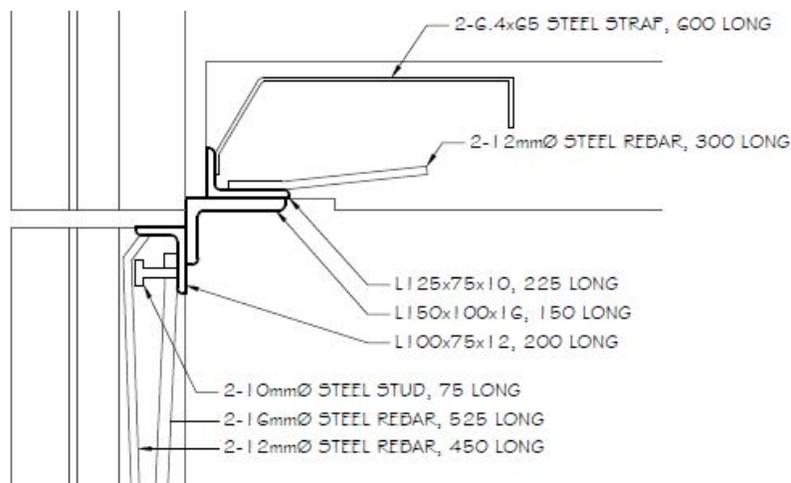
Detail of gravity connection, top-hung from the slab above. Detail from the Panel Anchor Investigation Report (RMA & Cooke, 2011)
